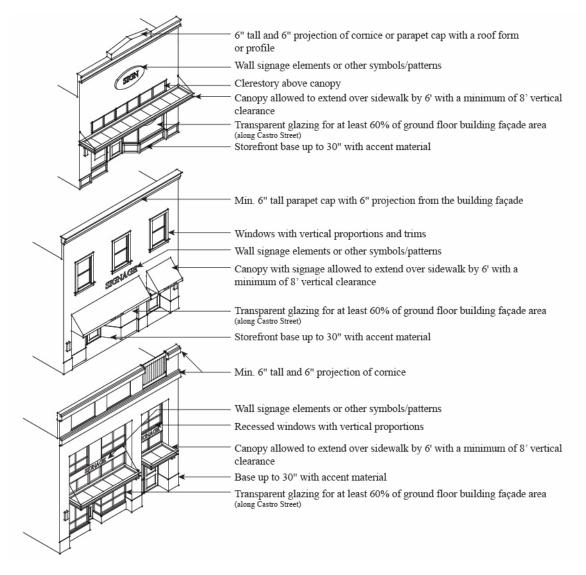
Example of building facades with different architectural styles utilizing the same design features such as roof articulation, canopies, windows etc.
